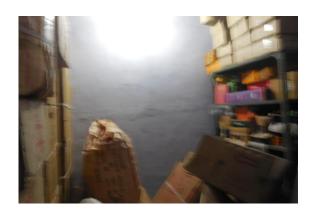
Wall No. 3 & 1 of Room No. 1 of Ground Floor Covered with Material
